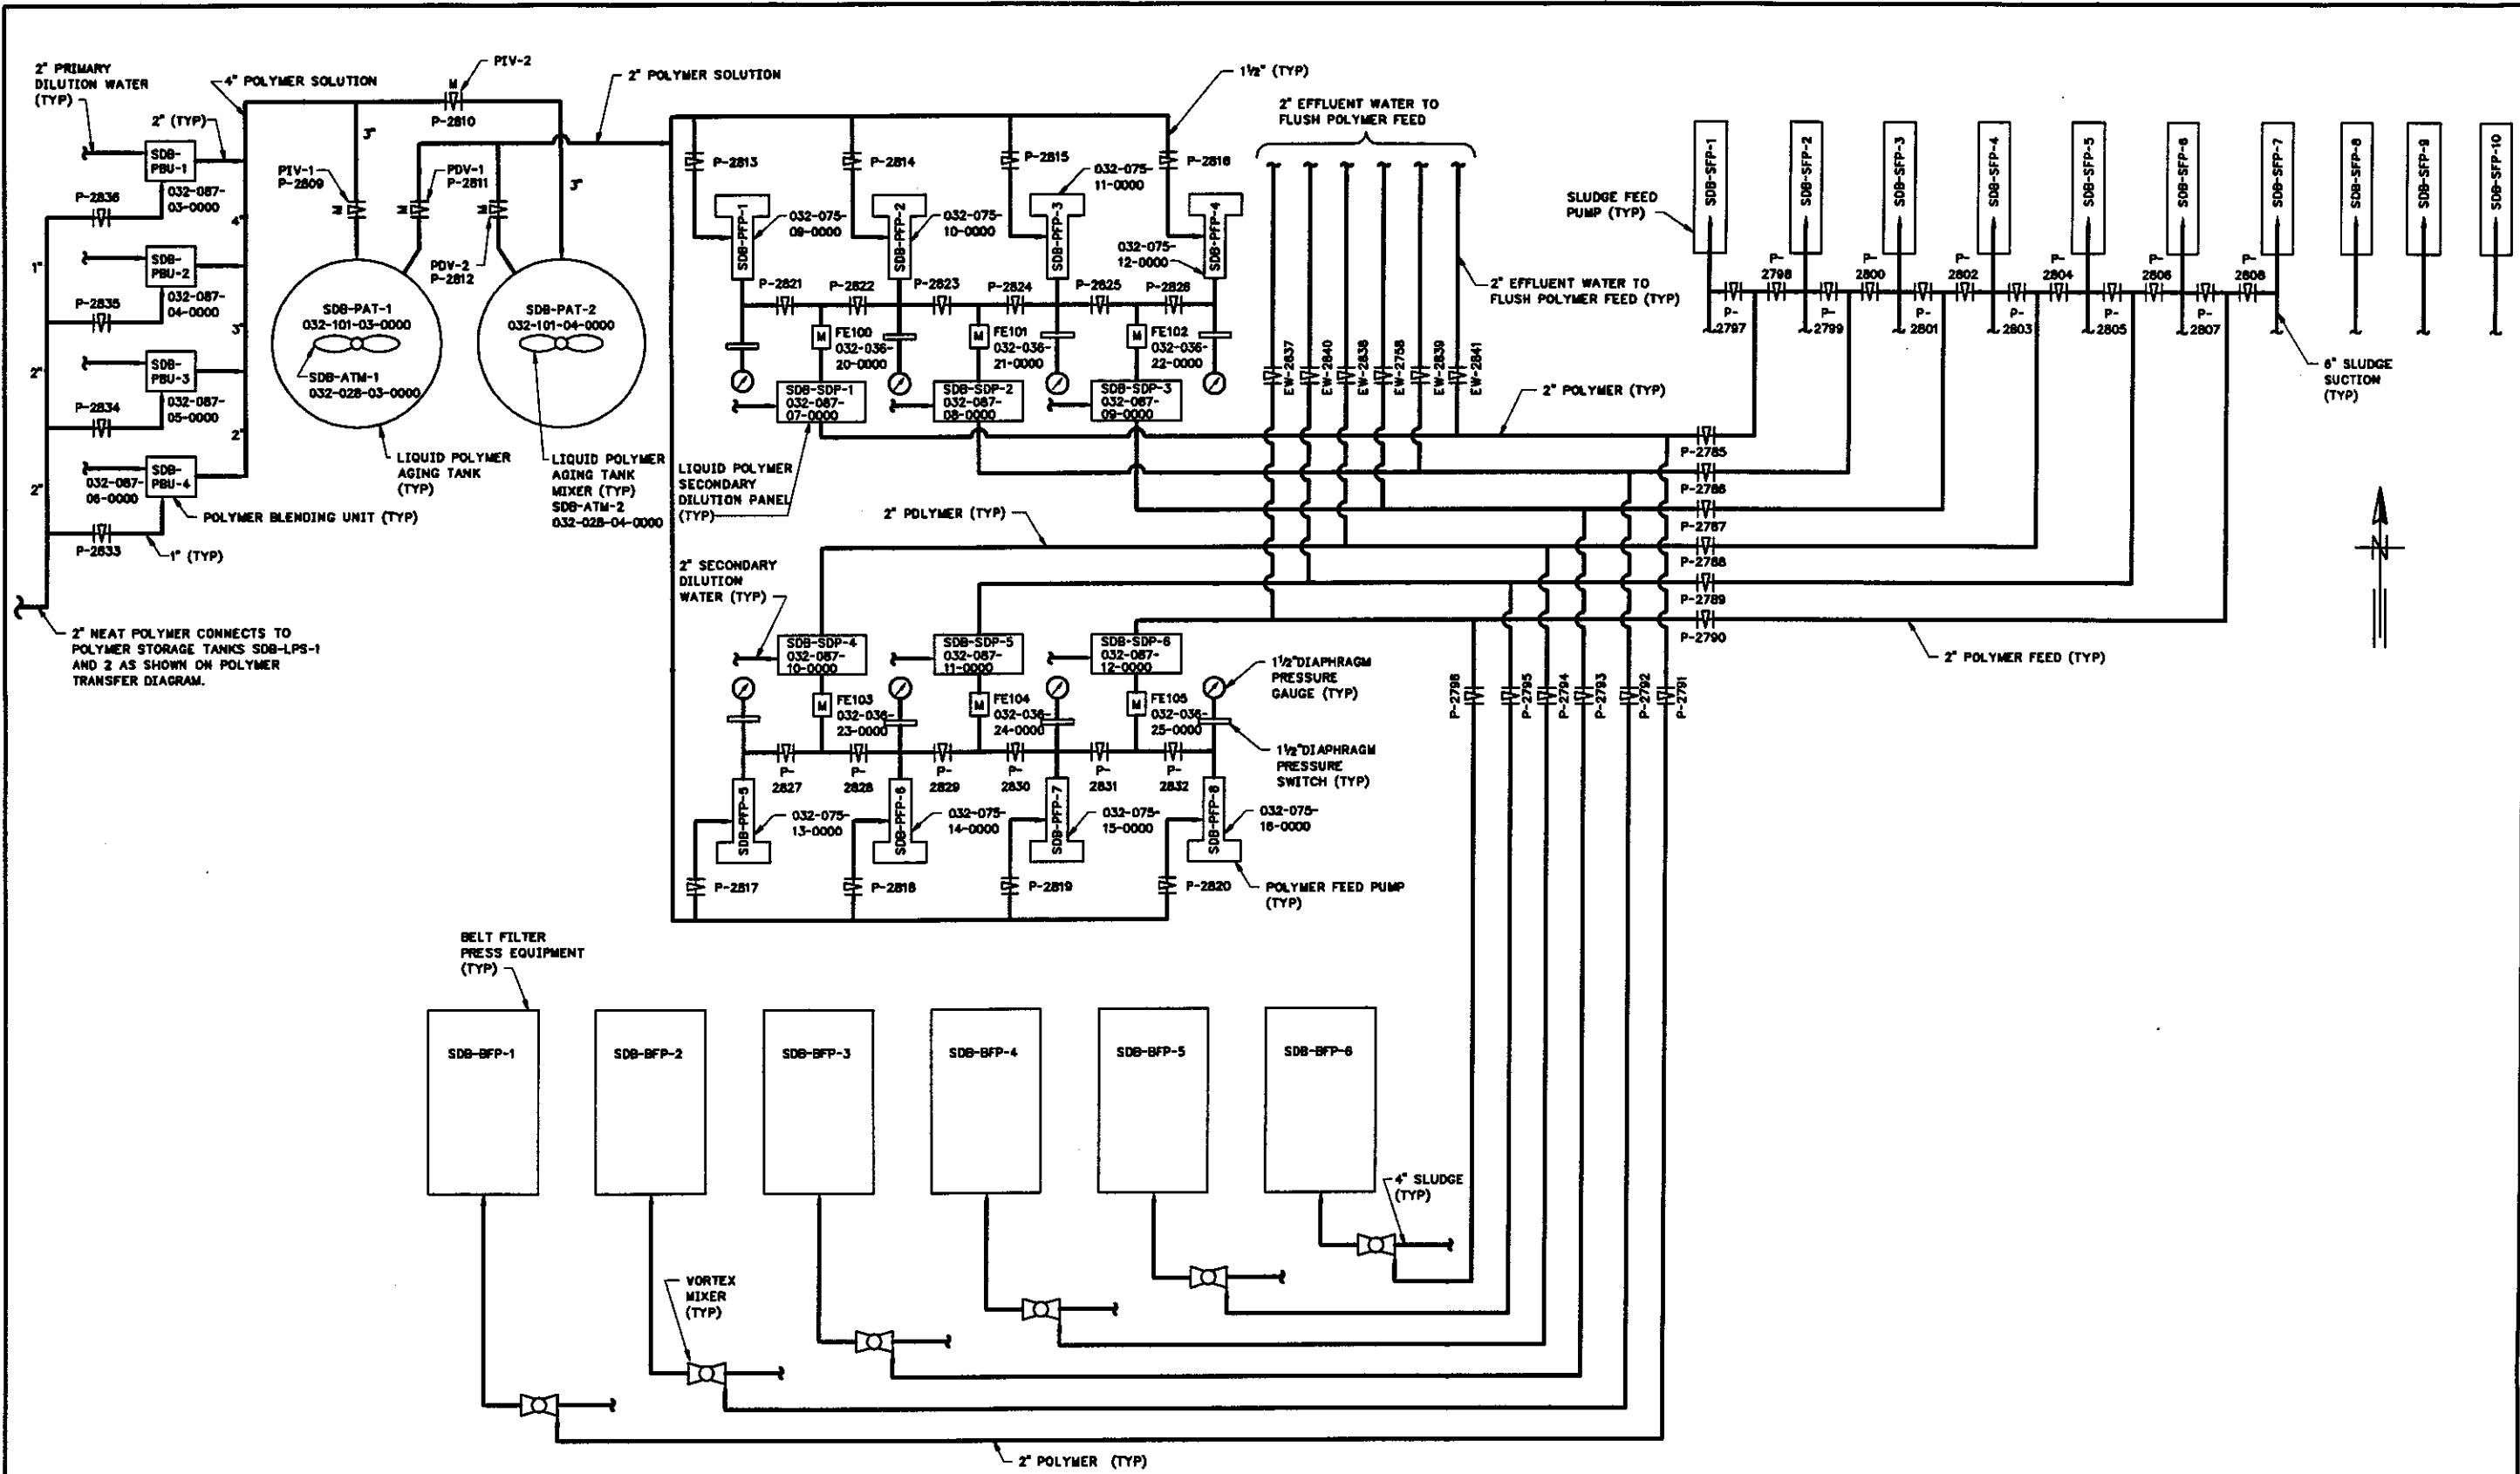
FIGURE III-SD-SDB-2 SLUDGE DEWATERING BUILDING
